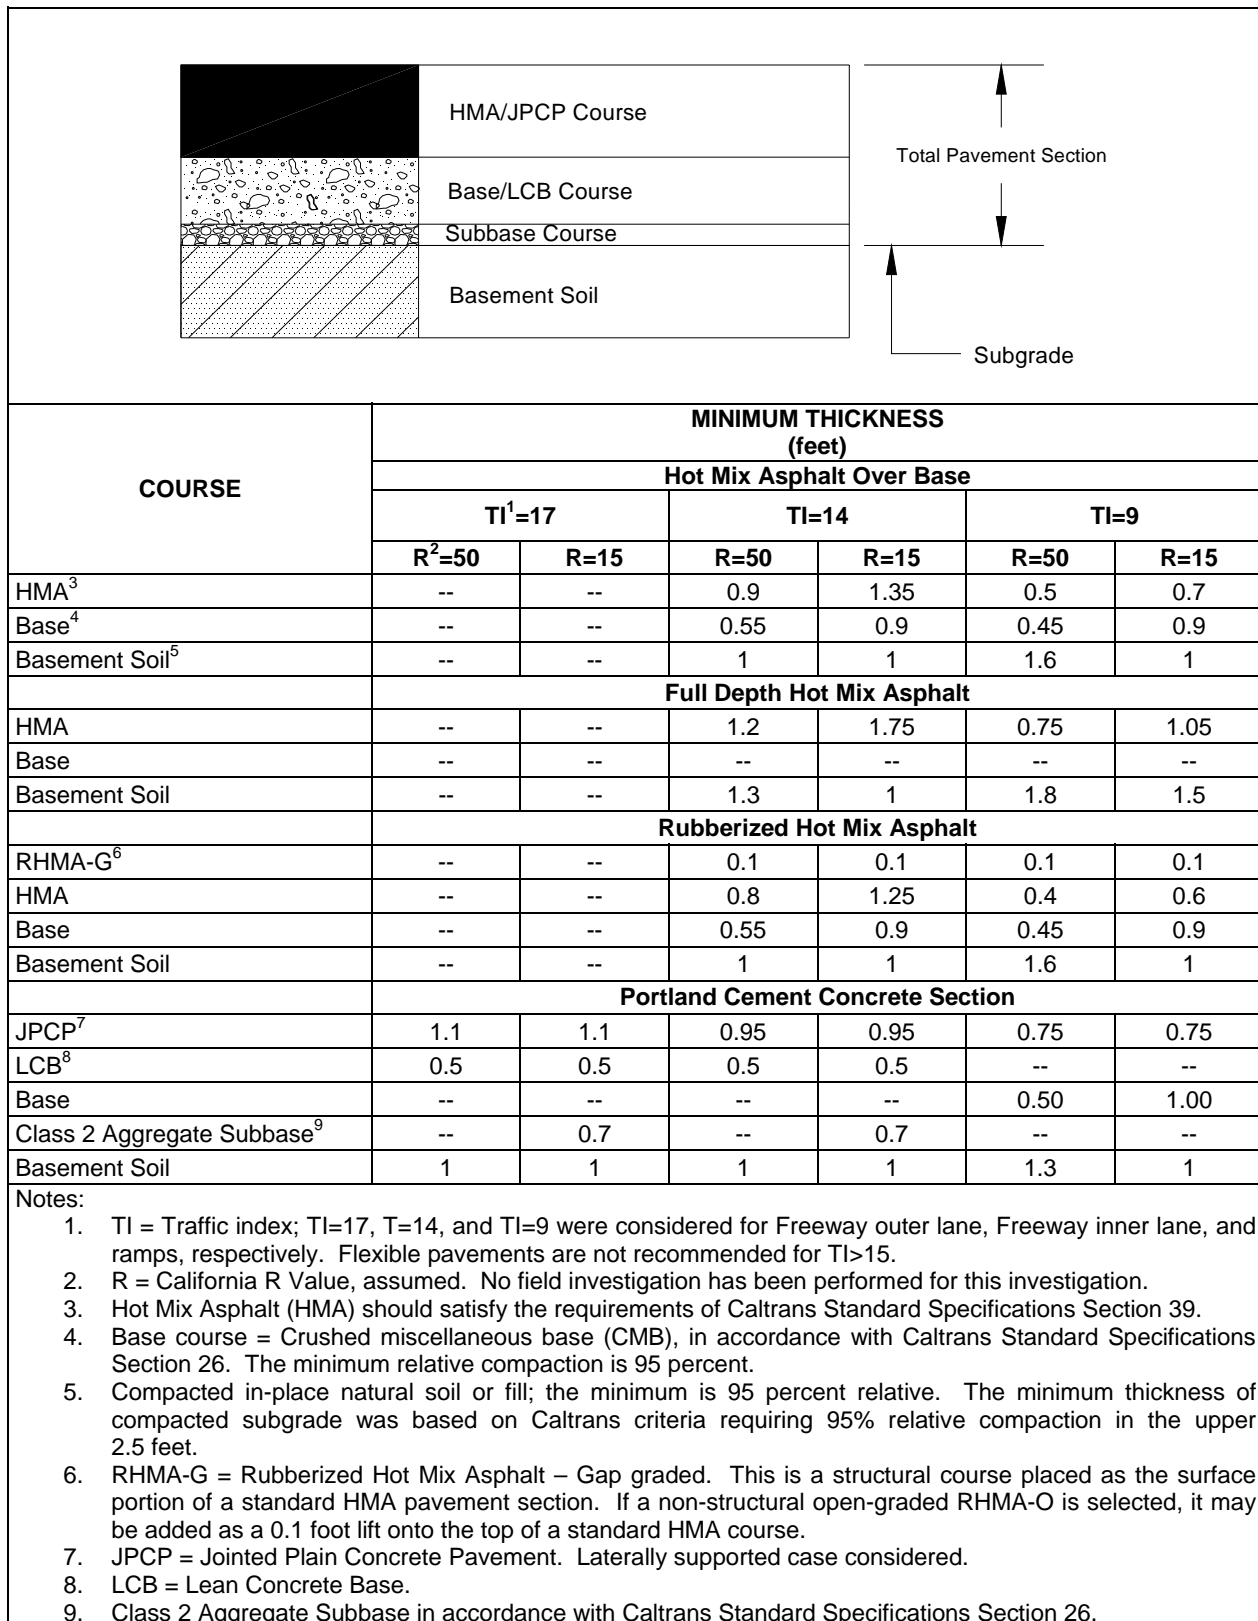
PAVEMENT THICKNESS RECOMMENDATIONS - FREEWAY LANES AND RAMPS
